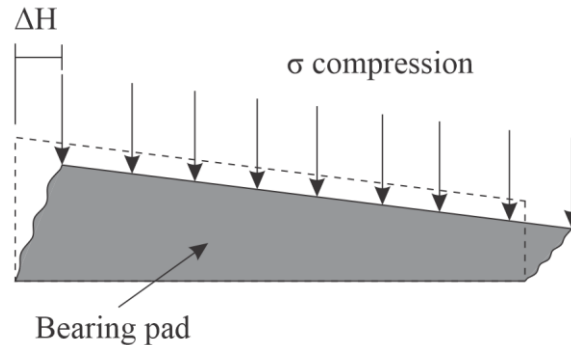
Horizontal deflection in tapered bearing pad under axial compression
